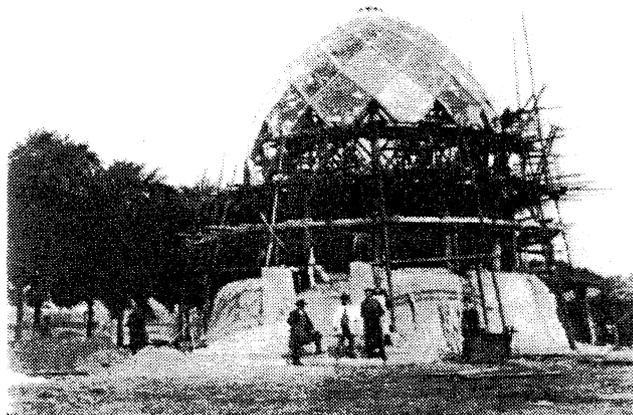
Bruno Taut, Glass Pavilion, 1914 under construction.
